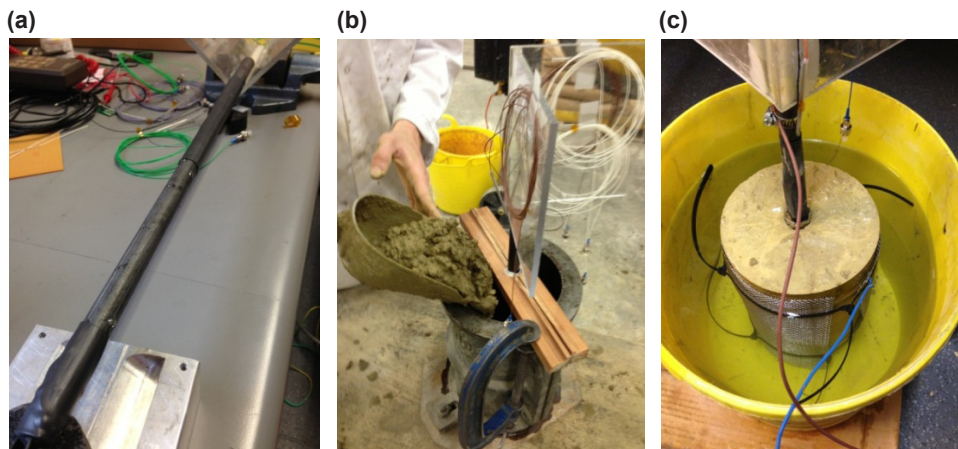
(a) Instrumented rebar prepared for the concrete sample; (b) the instrumented re-bar cast inside concrete. (c) Instrumented concrete cylinder prepared for the accelerated corrosion test.
